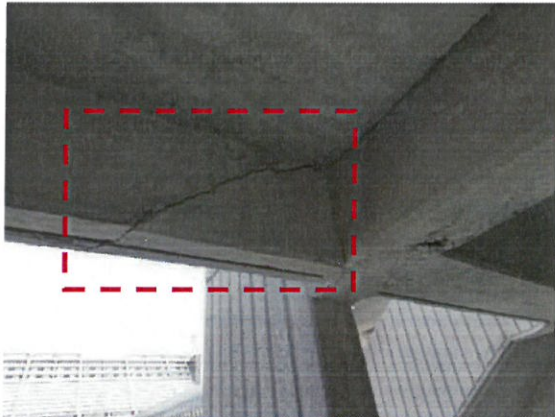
Differential movement between Parking Structure C and south stair/elevator tower
